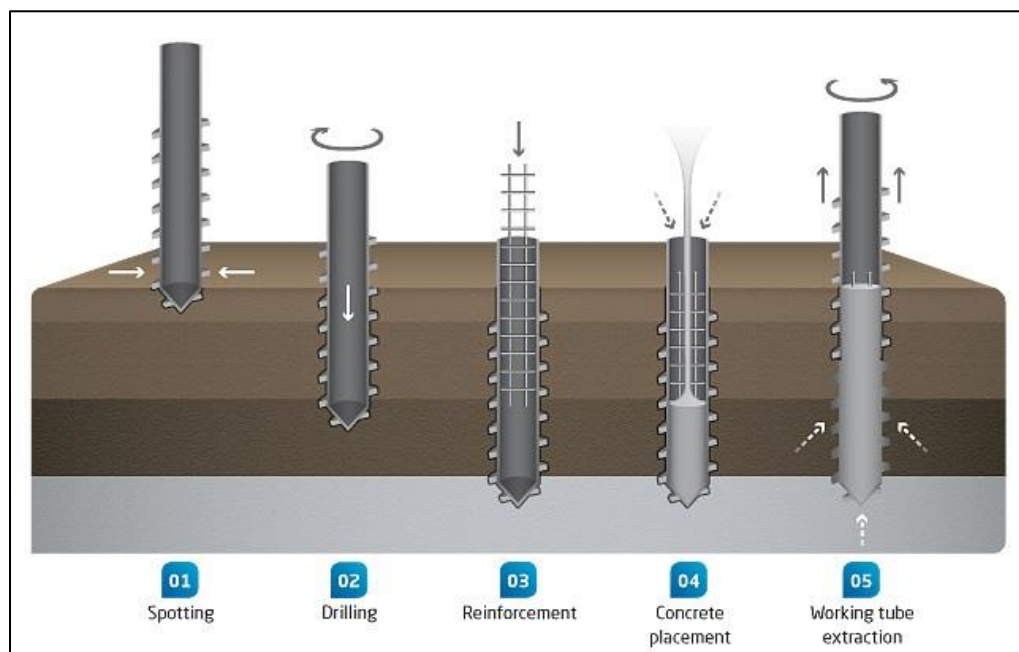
Execution sequence of a general screw pile (adapted from [www.junttan.com](http://www.junttan.com))
